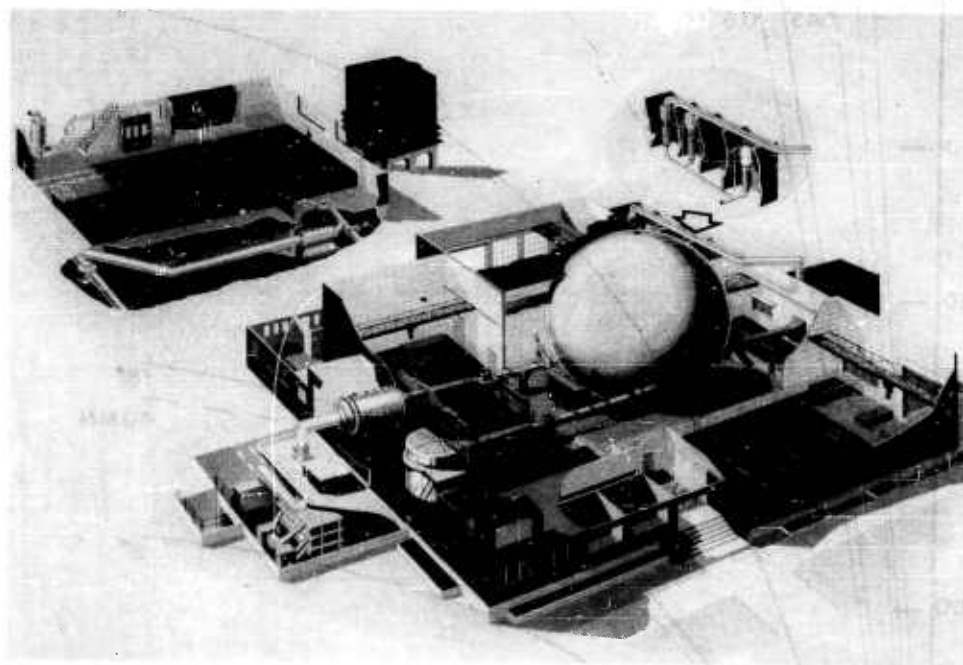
CUTAWAY DRAWING OF THE NOL WIND TUNNEL
